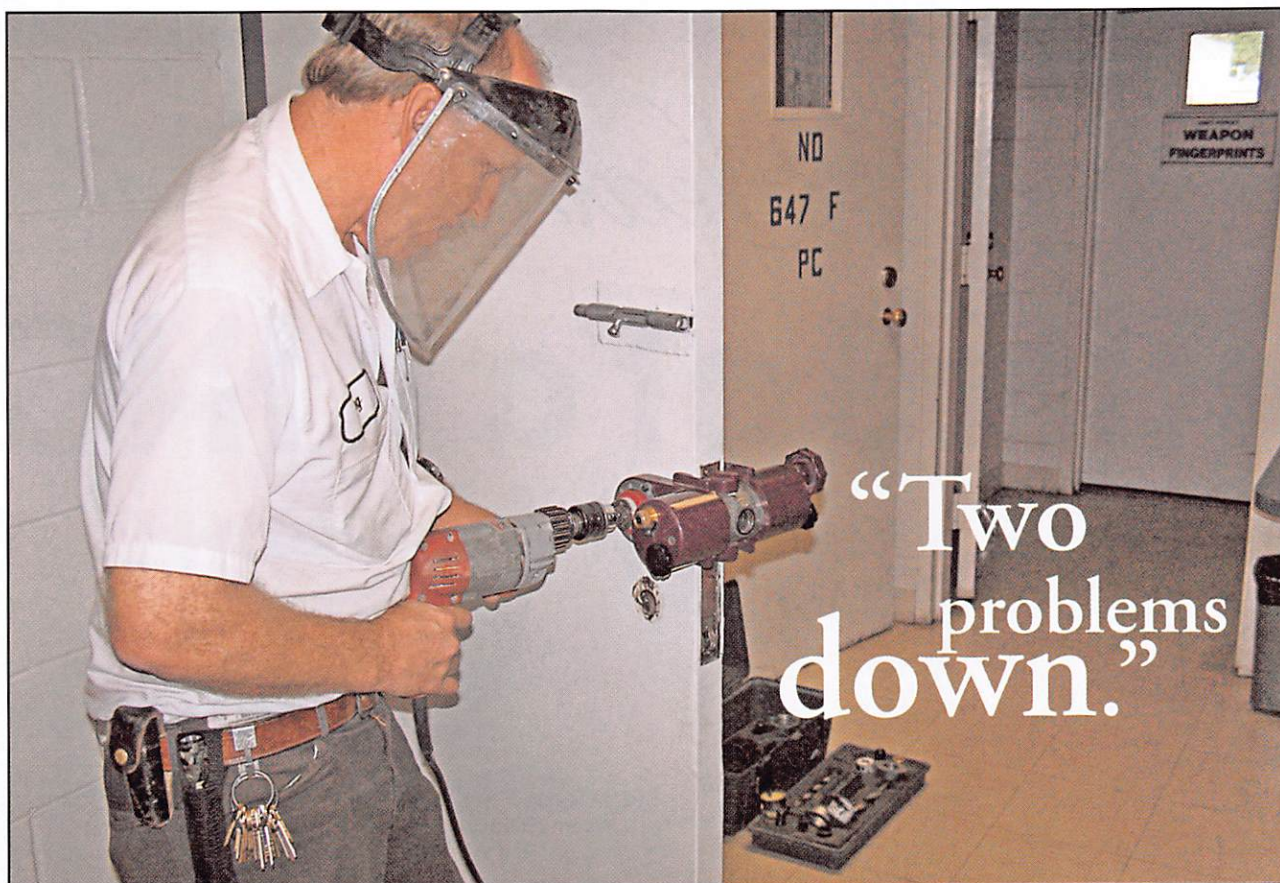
shows me redrilling the cylinder hole using a Major Hit44 drill fixture.
